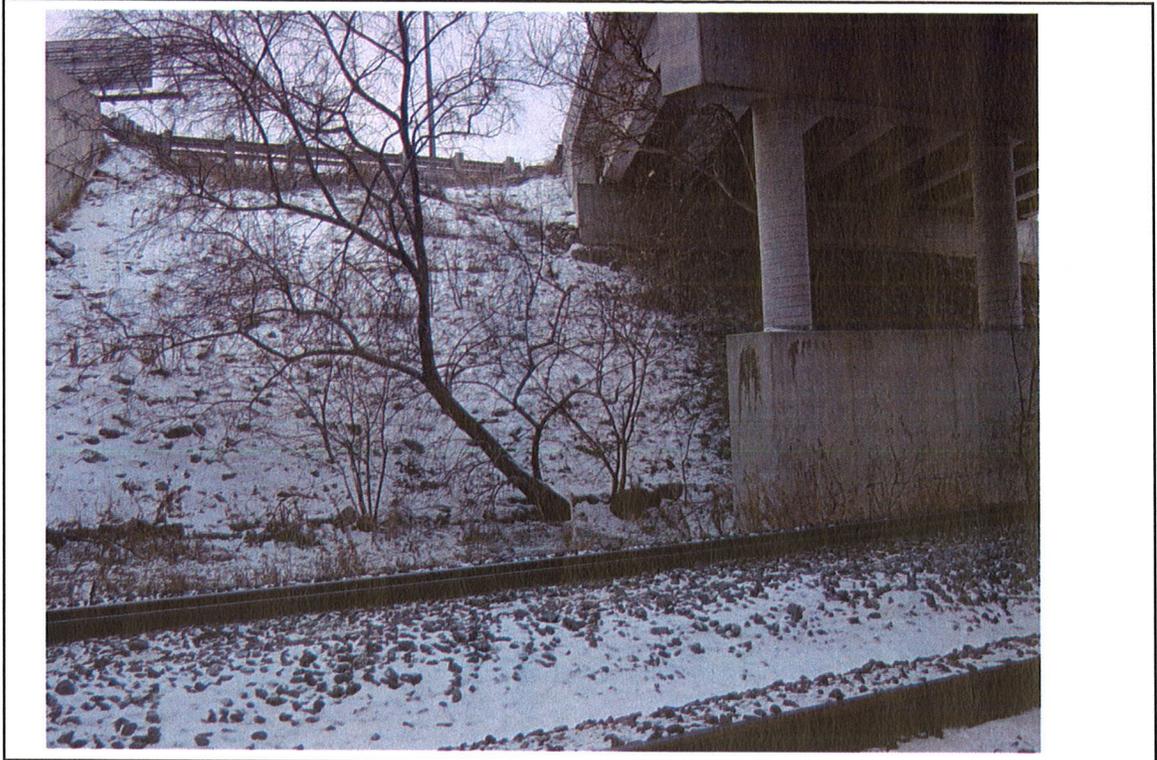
Looking at the existing south abutment and pier, Hwy 427 SBL (Boreholes CNH-02 and CNH-06)
